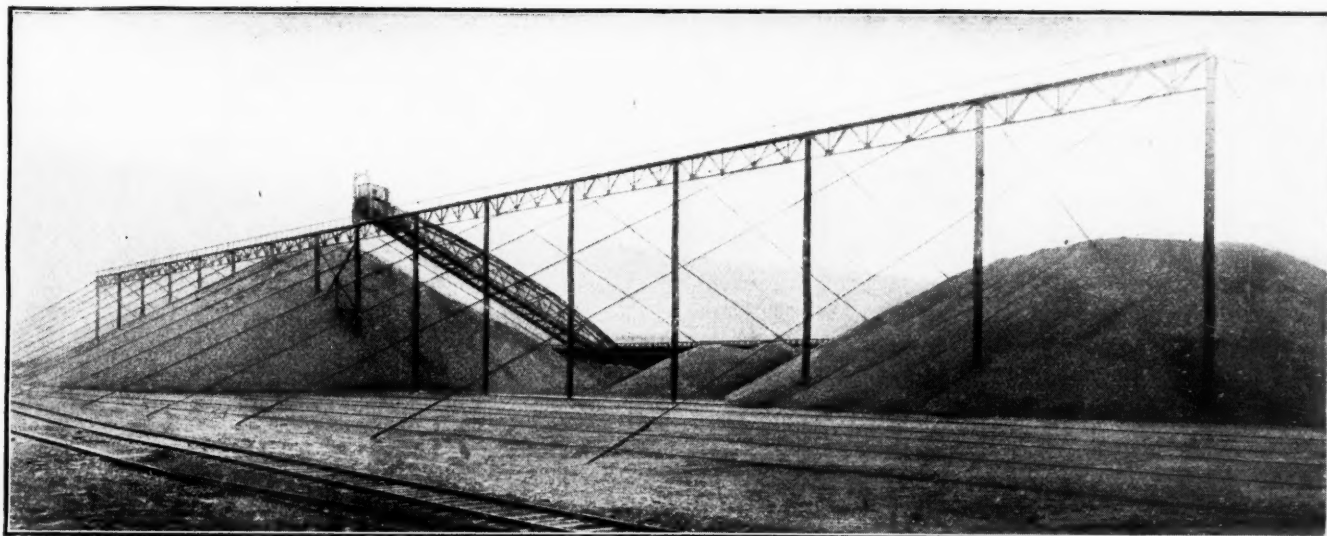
THE RECTANGULAR SYSTEM OF STORAGE PILING
